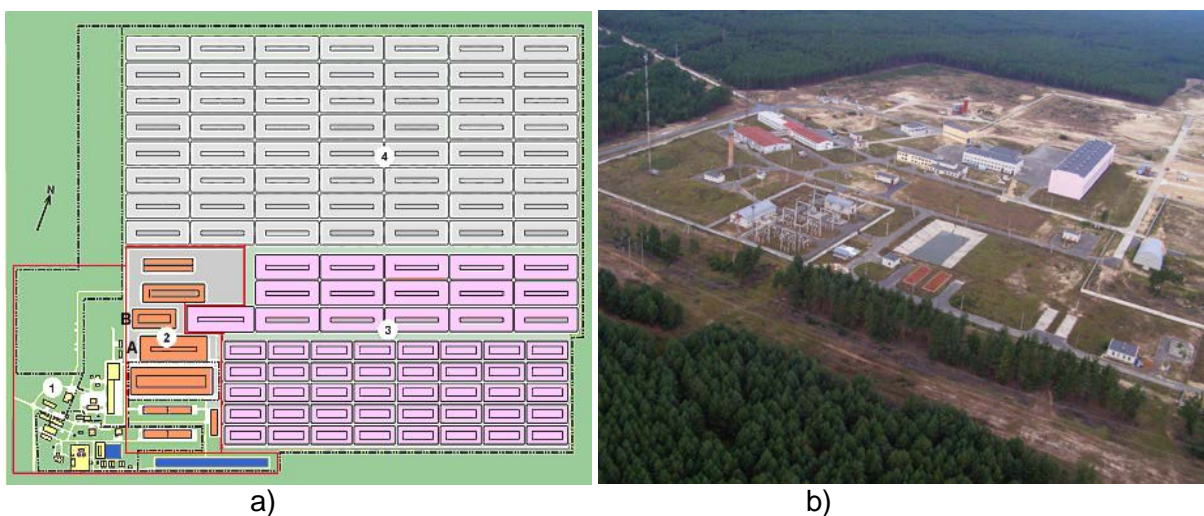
“Vector” site: a) general plan of processing and disposal center; b) overview of “Vector” territory
